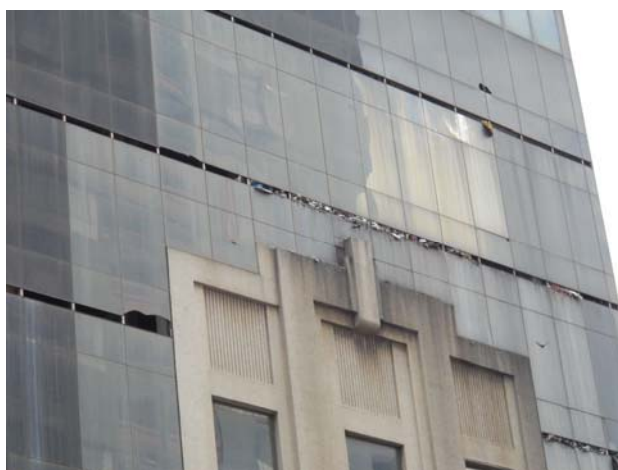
Garbage spews out of the edges of this building where Zimbabweans live, March 2010
